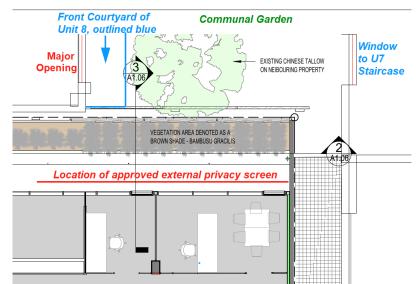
Ground floor plan of No. 276 Newcastle Street showing context of proposed bamboo landscaping screening
